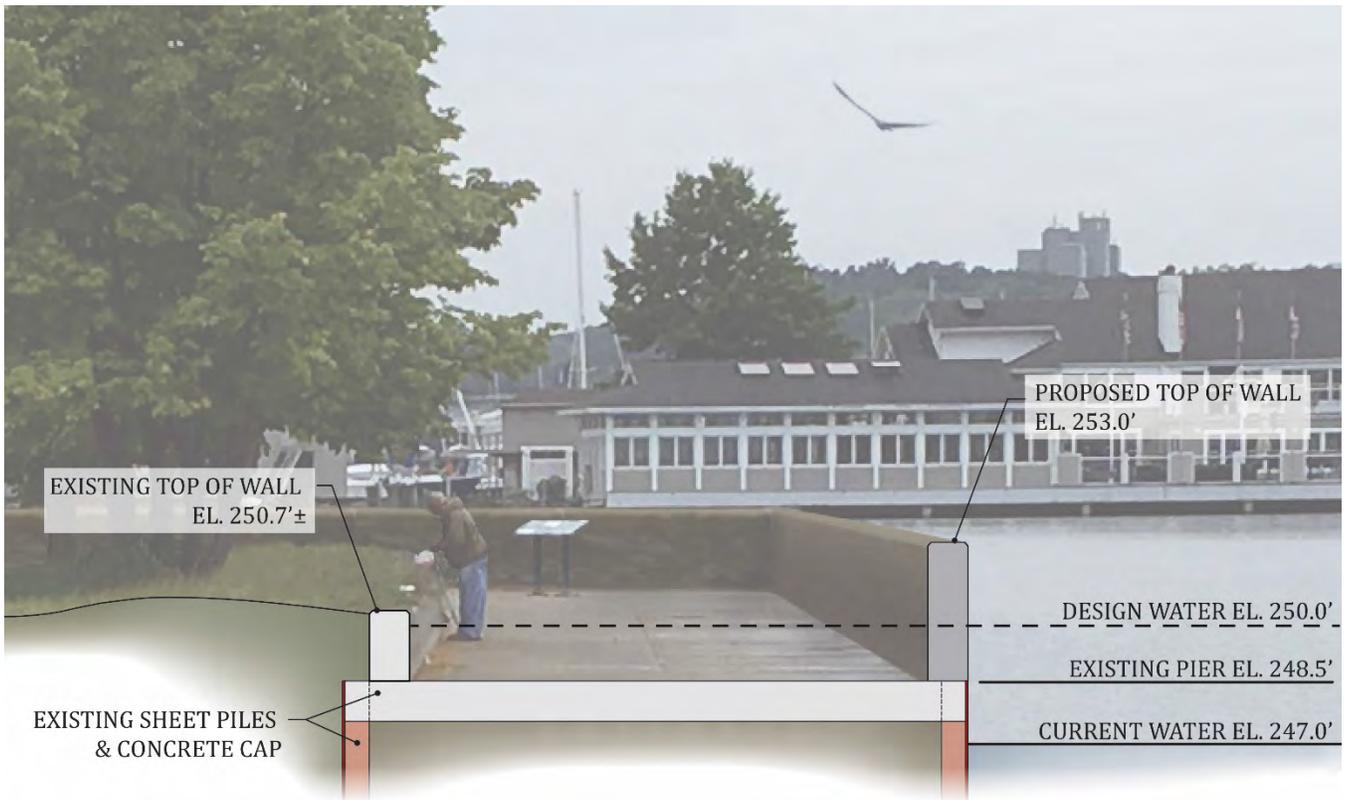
Typical Section of Proposed Seawall at NYS-DEC Fishing Access Area
